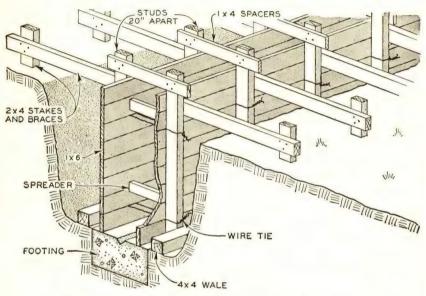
Tailor-Made Formwork for Concrete Foundations Where No Basement Is Required
